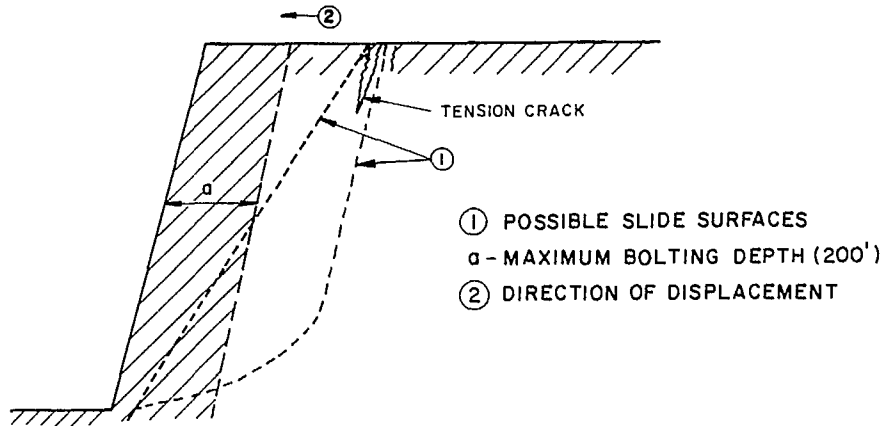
Illustration of potential pit wall slide surfaces and maximum bolting depth.
